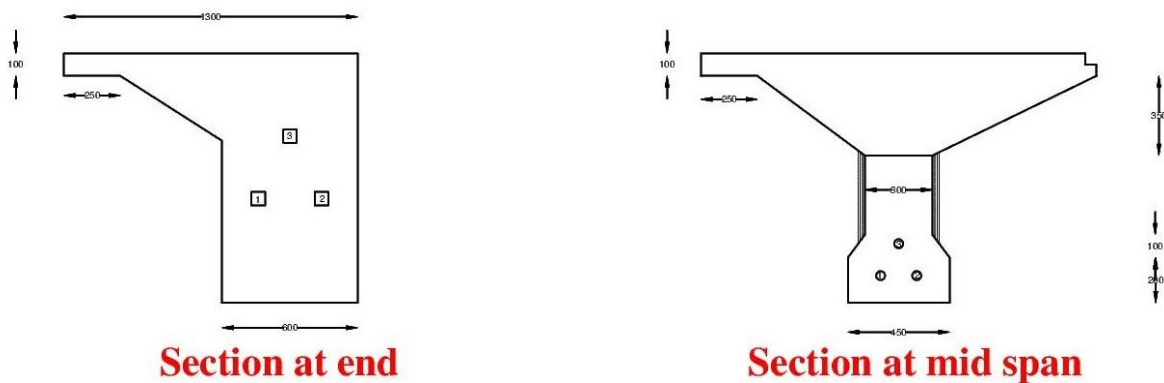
Sectional Details of Gantry girder at Ends and at Mid span
